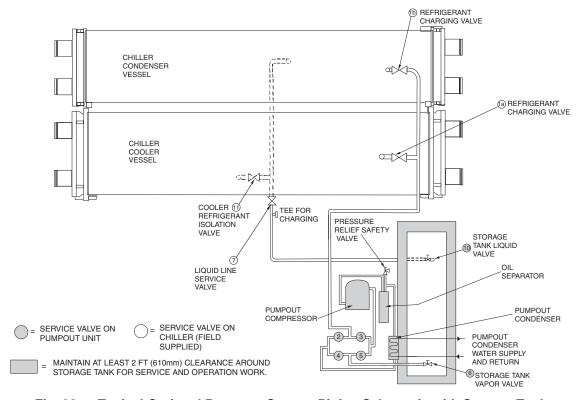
Typical Optional Pumpout System Piping Schematic with Storage Tank
